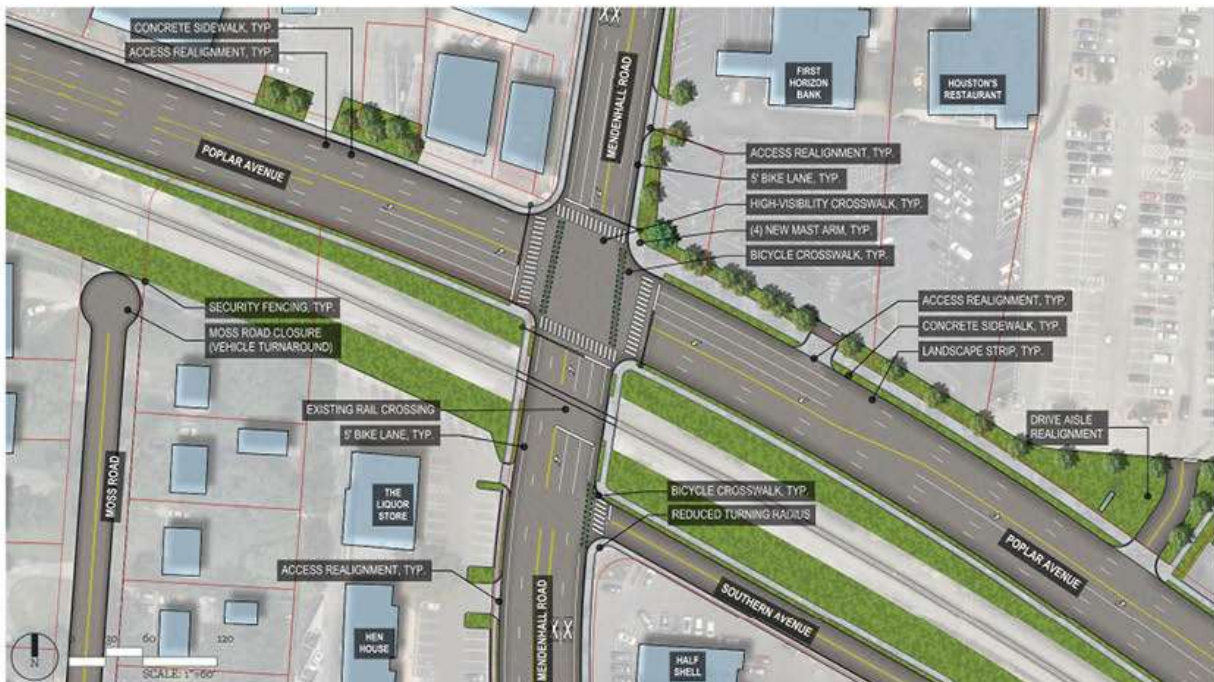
Poplar Avenue at Mendenhall Road Existing Aerial and Concept Plan
